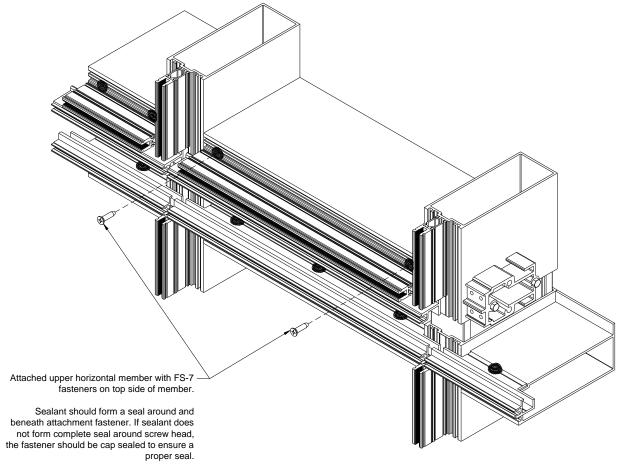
Upper Expansion Horizontal Assembly and Sealing
